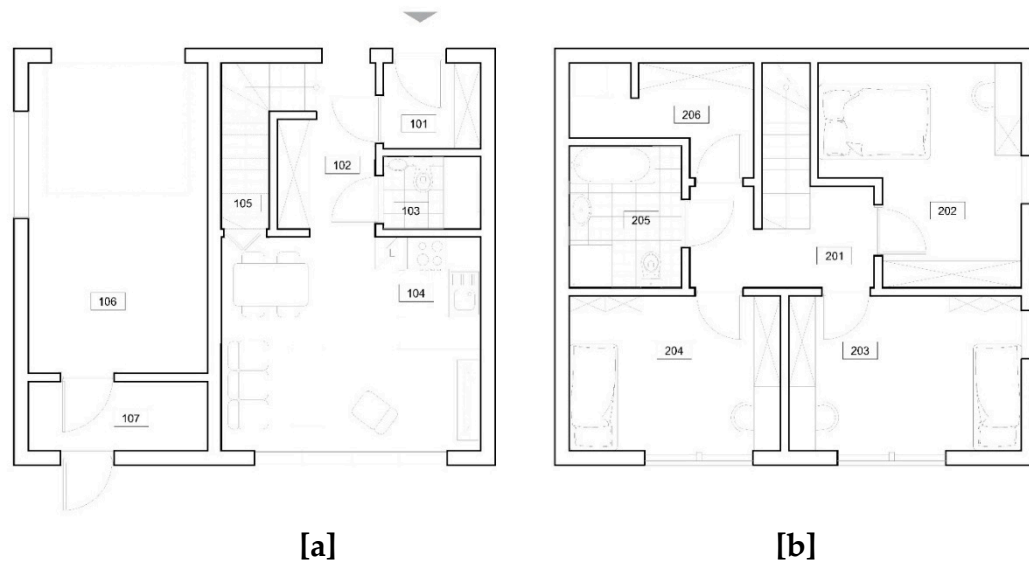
[a] Ground floor plan, description of rooms: 101 – Entrance lobby (Entry), 102 – hall, 103 – bathroom, 104 – living room with kitchen, 105 – utility room, 106 – garage, 107 – technical room. [b] Floor plan, description of the rooms: 201 – Landing, 202 – bedroom I, 203 – bedroom II, 204 – bedroom III, 205 – bathroom, 206 – utility room.
